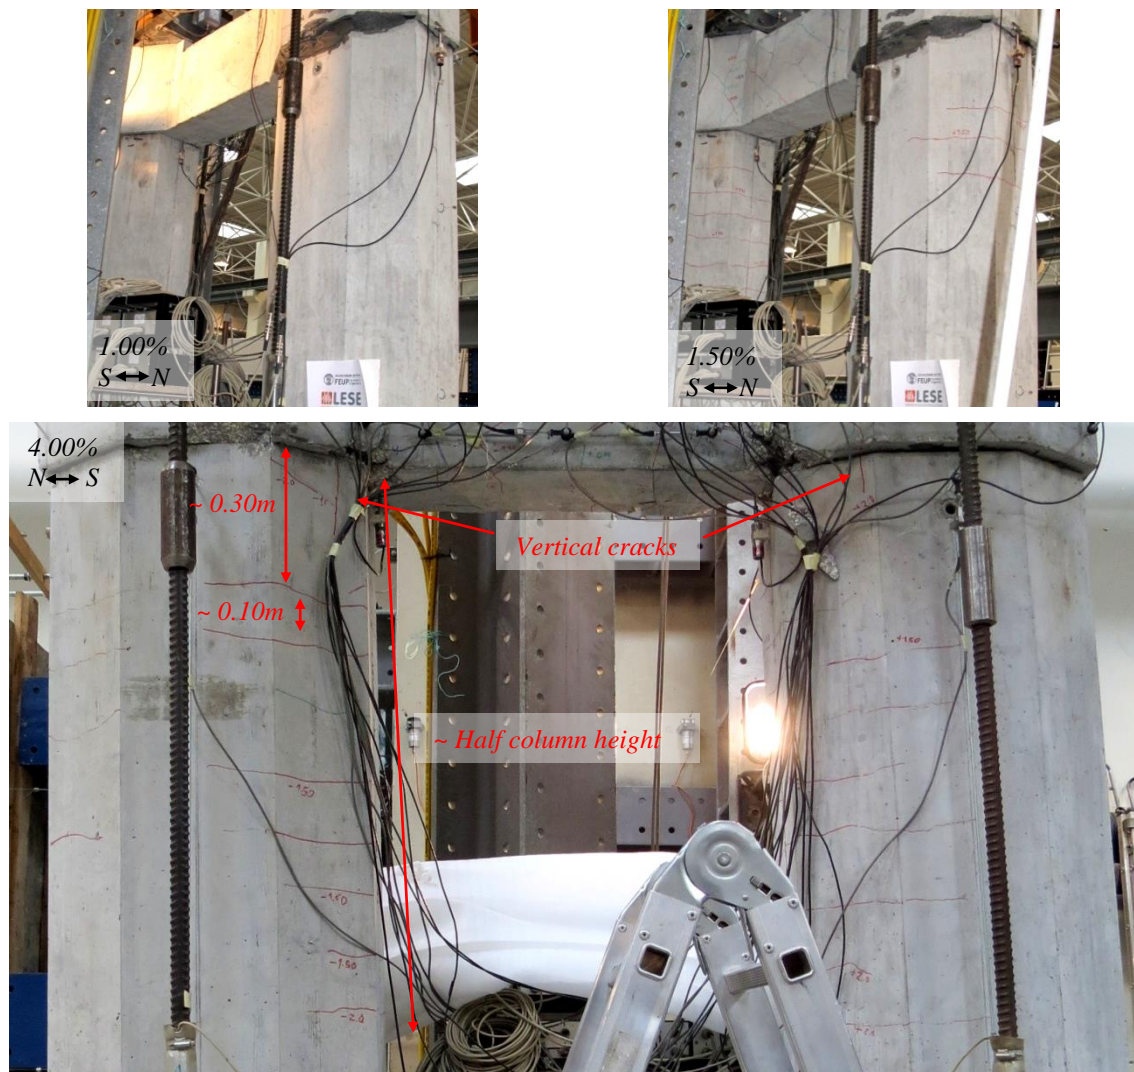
SP_PC02B Column cracking patterns
